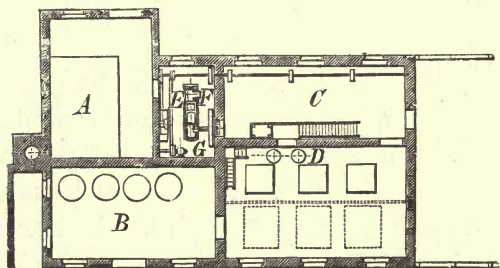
Ground plan of works. A, Boiler house; B, Store and refinery; C, Grinding room, elevator; D, Extraction house.
